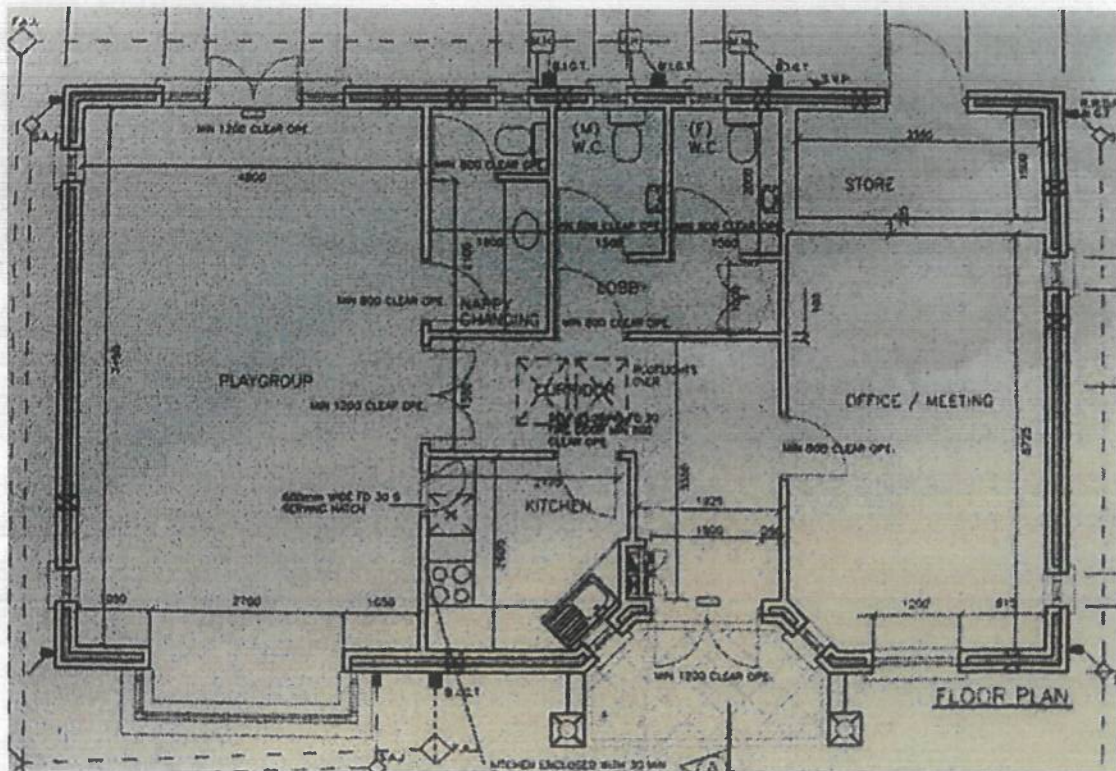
Floor Plan of Communal Facility granted permission under planning reference 98/687 which indicates the room which is subject of The Section 5 is identified as an Office/Meeting Room
